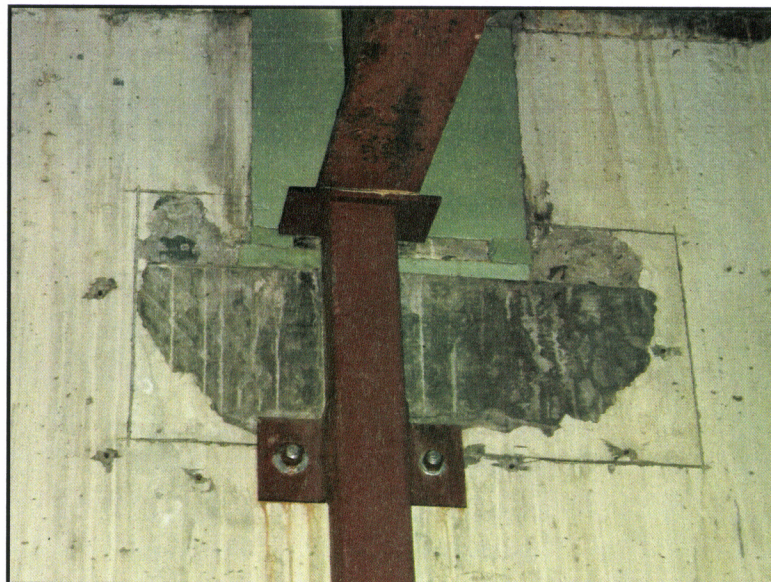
Previous Repair Work at Steel to Concrete Connection
